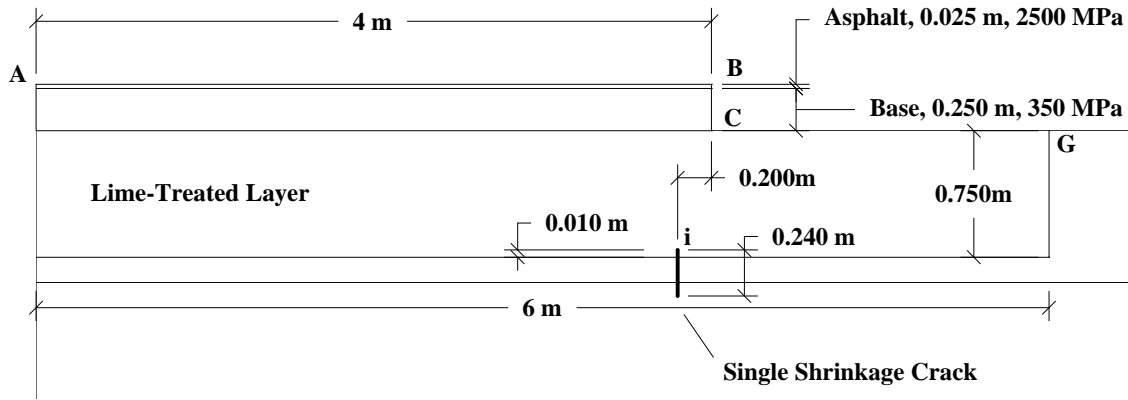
Single Shrinkage Crack in Subgrade Soil (Model 1).
